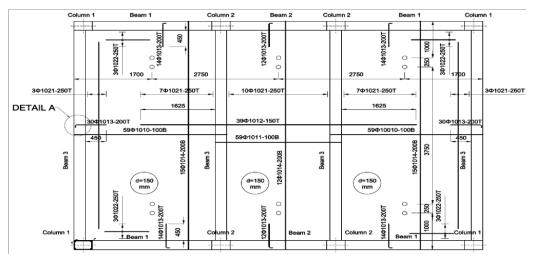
Reinforcement of slab, T refers to top and B refers to the bottom
